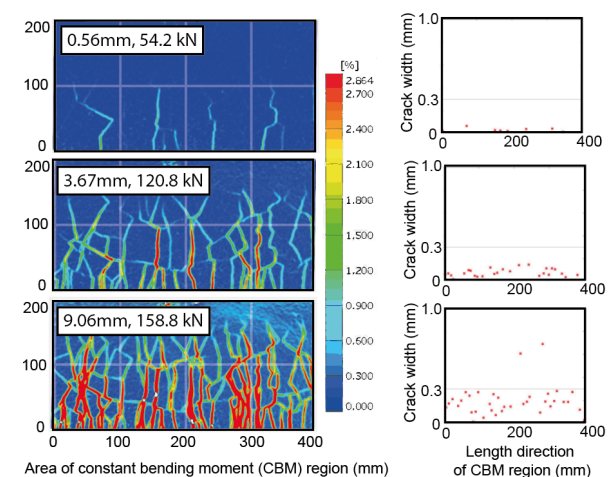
Crack pattern of the hybrid beam with bottom shear-key.
